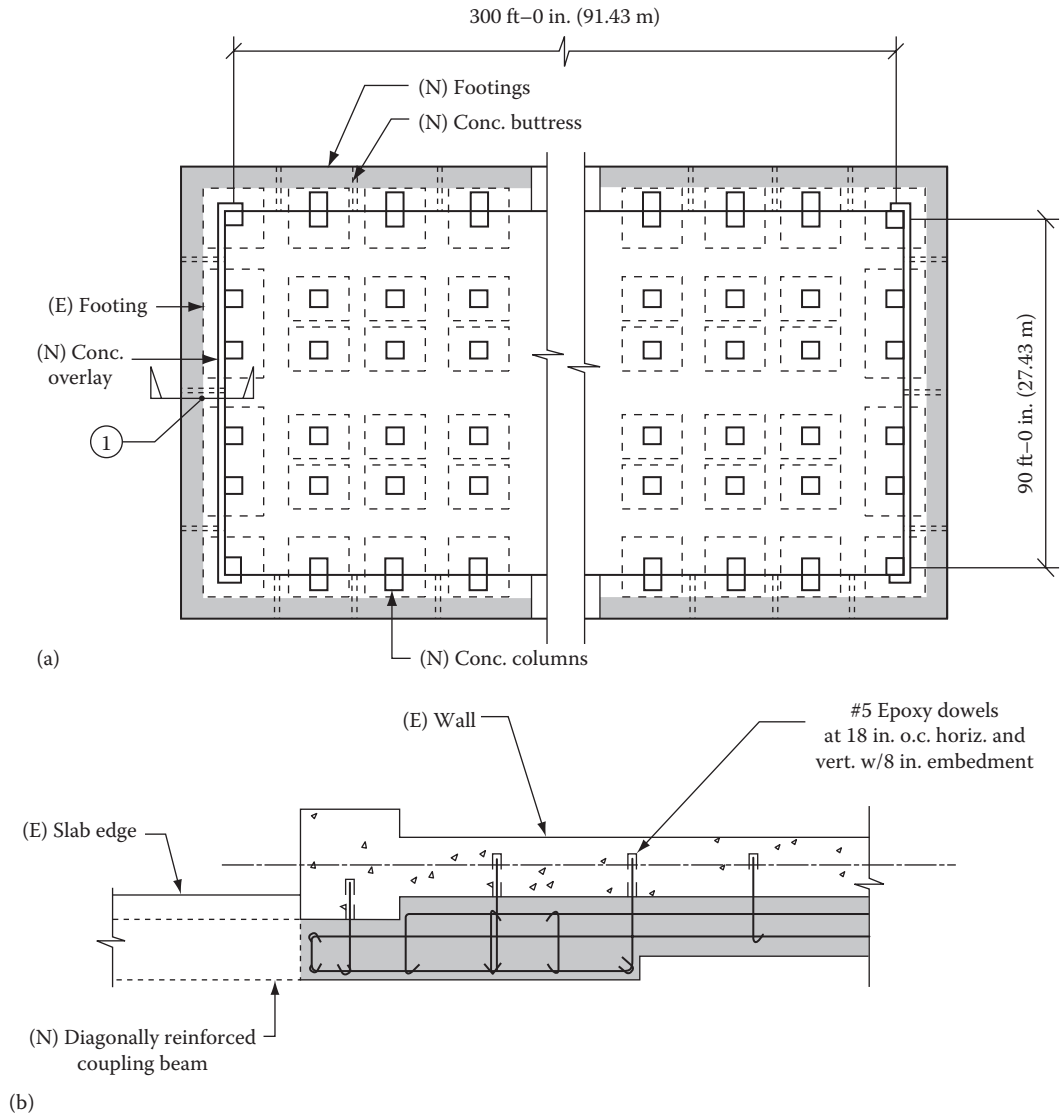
Seismic upgrade of a concrete hospital building with an external concrete moment frame. Modifications are restricted to the periphery of the building to keep the building operational with minimal interference to its functionality: (a) plan showing (N) foundation, (N) concrete overlay in the transverse direction, and (N) moment frames in the longitudinal direction; (b) enlarged plan at (N) coupling beam and shear wall overlay. *(Continued)
